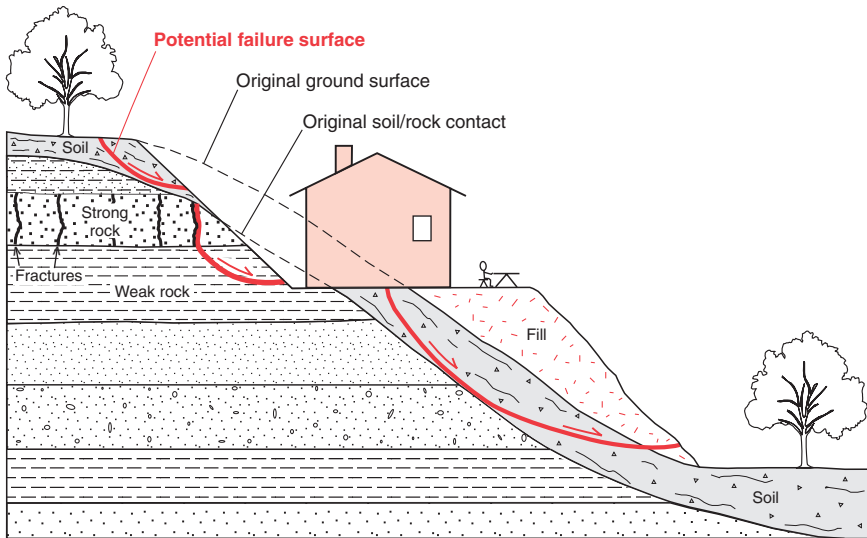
Some possible effects of the cut-and-fill technique of slope modification. In the steep excavated face above the house, both soil and rock can fail because of lost support. Below the house, the additional load from carelessly placed fill may trigger slump failure of the underlying soil. Cutting and filling also allows water to enter slope materials, and can block free drainage of water from the lower slope.
